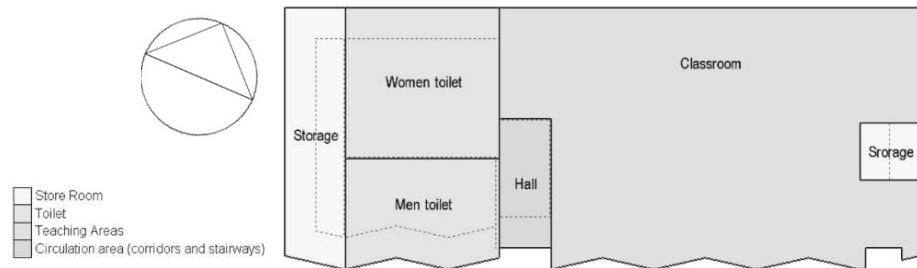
Cardboard Classroom floorplan (Authors via DesignBuilder). Image 7.4.1—Cardboard Classroom floorplan (Authors via DesignBuilder).
